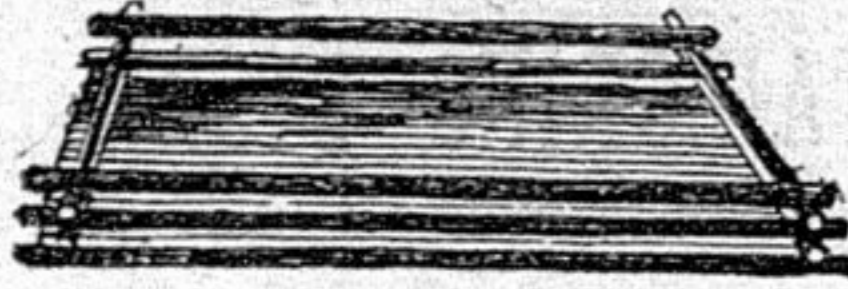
RAIL FLOOR FOR HAYSTACK.
